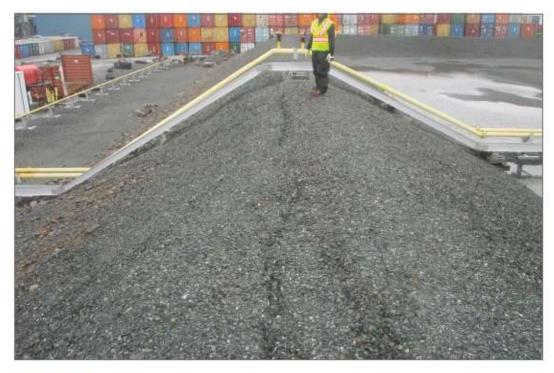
Industrial Fuel Storage Tanks—Cracking on top of berm. Settlement and erosion under pipe infrastructure.
